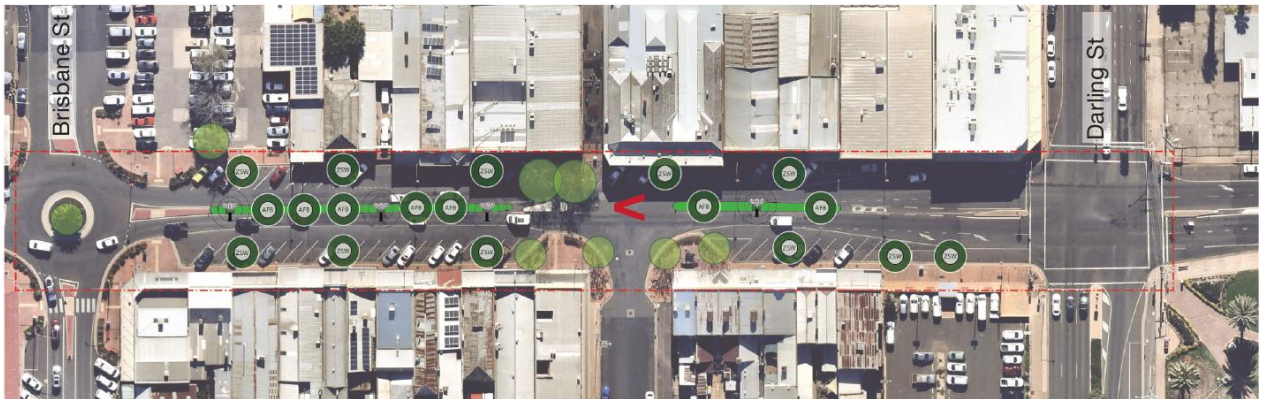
Preliminary tree planting locations, Brisbane Street to Darling Street.
